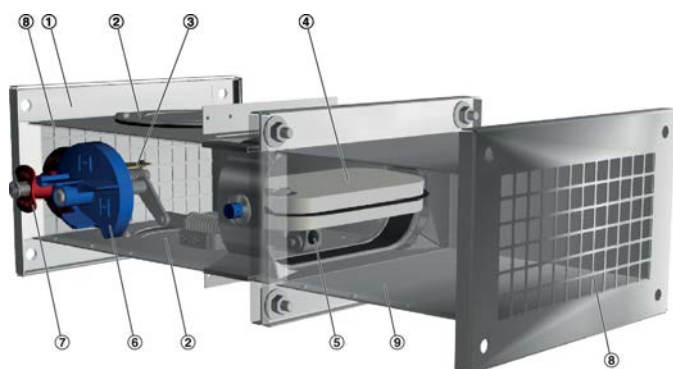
FKS-EU with fusible link and cover grille used as an air transfer unit
